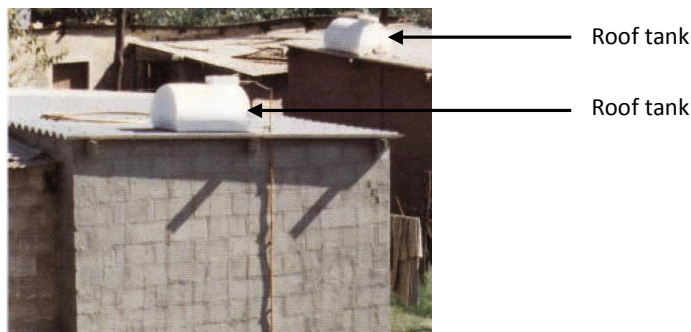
Illustration of a water storage tank (roof tank) located on the roof of a household.
